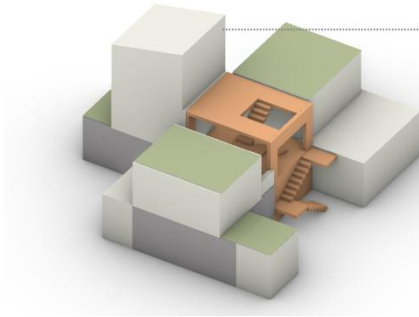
Concept Design 2: Modular Multi-Story Units with Shared Roof Gardens (by the author)
